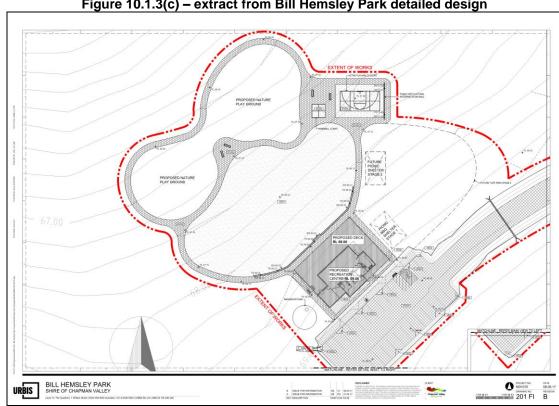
(c) – extract from Bill Hemsley Park detailed design
